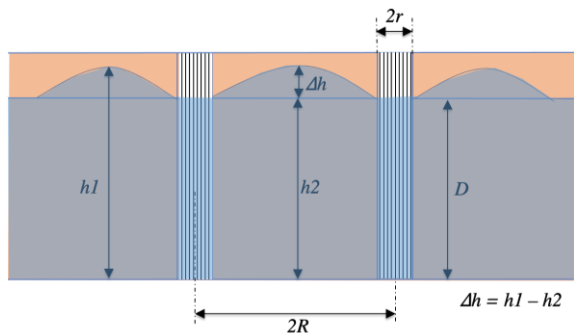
Relief Well Section A [adapted from Massad] (2010).
